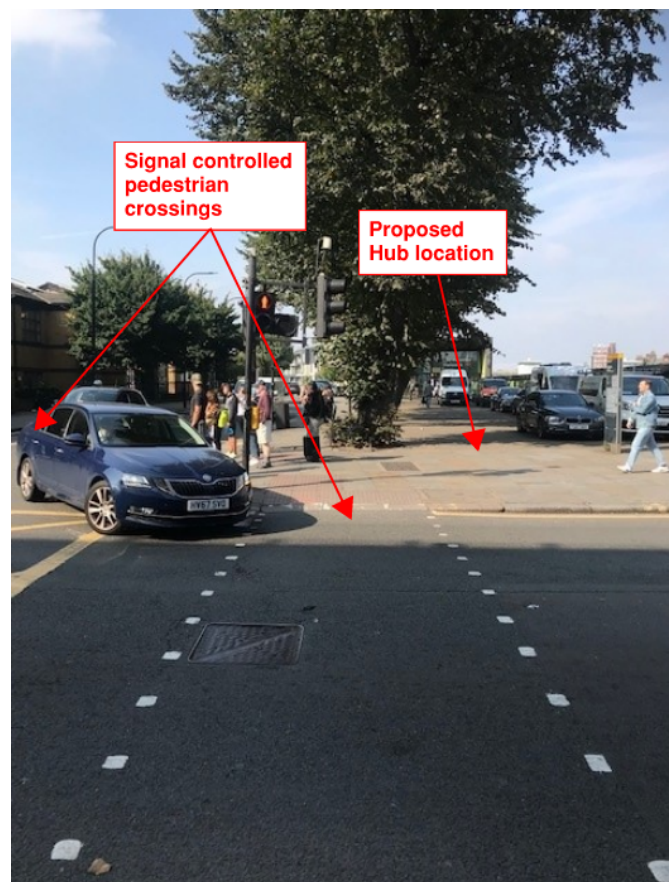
showing proximity of application site to signal-controlled pedestrian crossing (looking west over West End Lane crossing)
